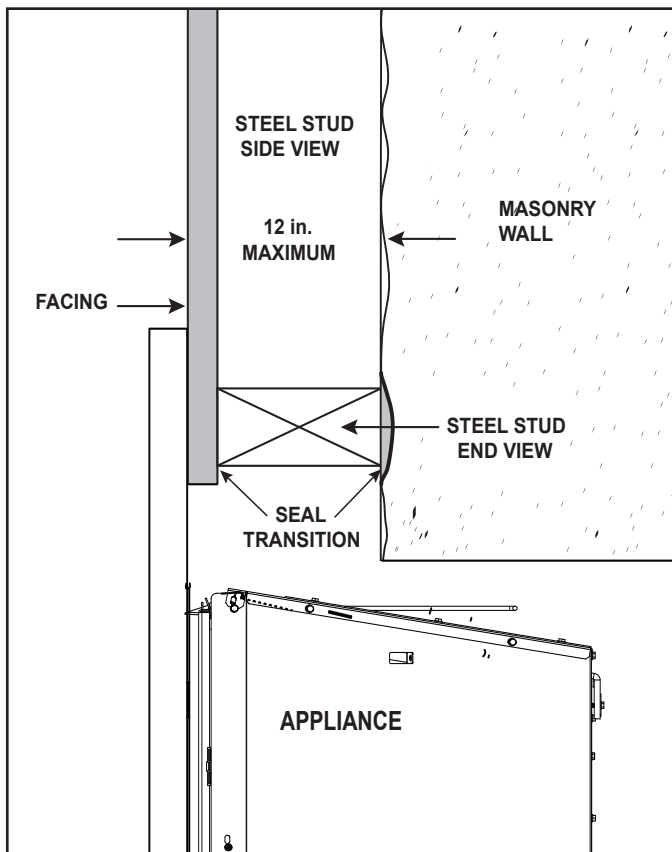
Transition Sealing Detail for Wall Extensions (Side View)
